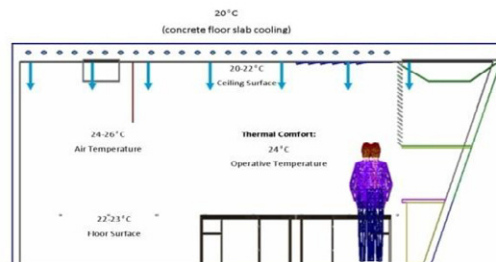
Section showing the floor slab cooling. (Source: Malaysia Energy Commission)
